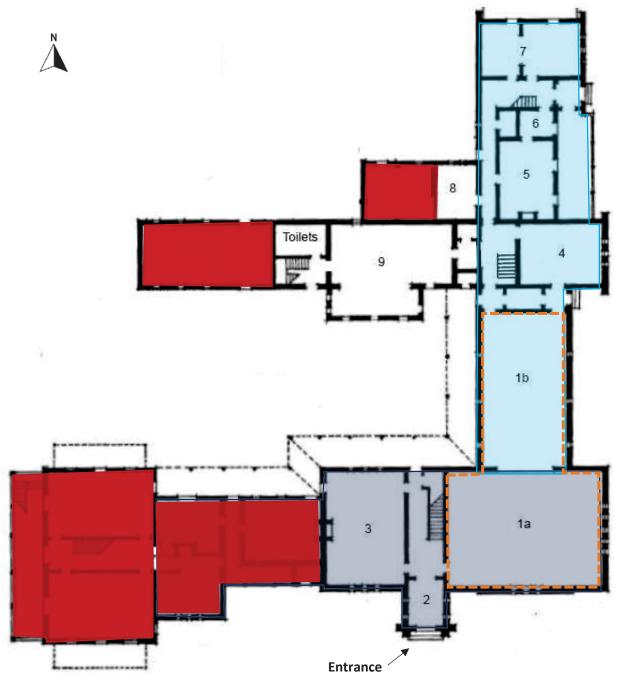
Ground Floor Plan of Early Building Complex with original 1863 building [Blue], and the 1865 building [Dark Blue]. The Great Hall is also indicated with an [Orange] dash.
